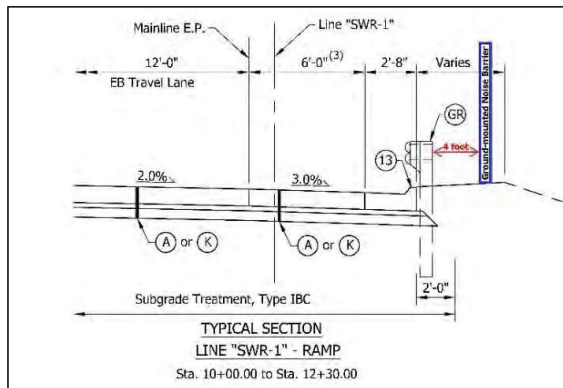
Guardrail typical section along Barker Avenue eastbound exit ramp
